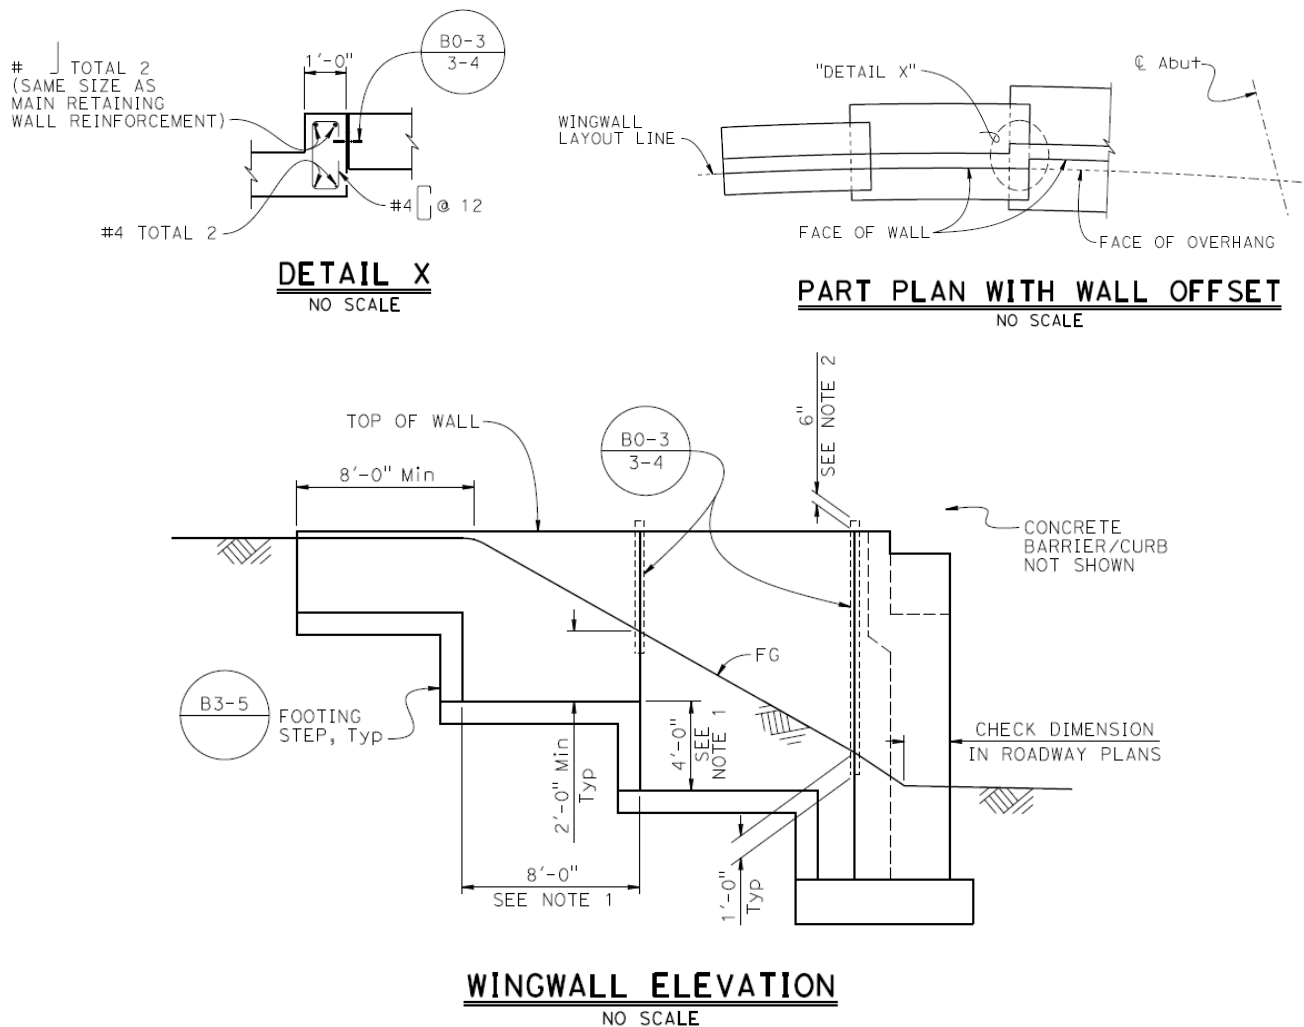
Seat Abutment with Standard Plan Wingwall
